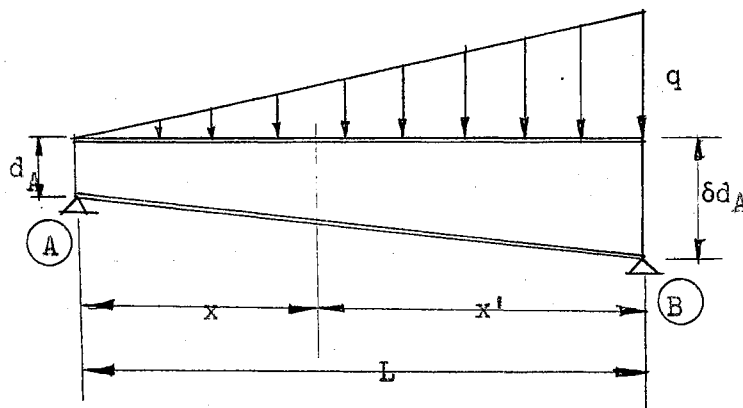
A Tapered Beam of I-Section, Box Section or T-Section Triangular Load.
